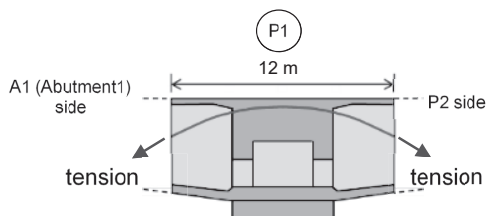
Arrangement of a cable subject to measurement (internal cable of the Pier 1 capital)
